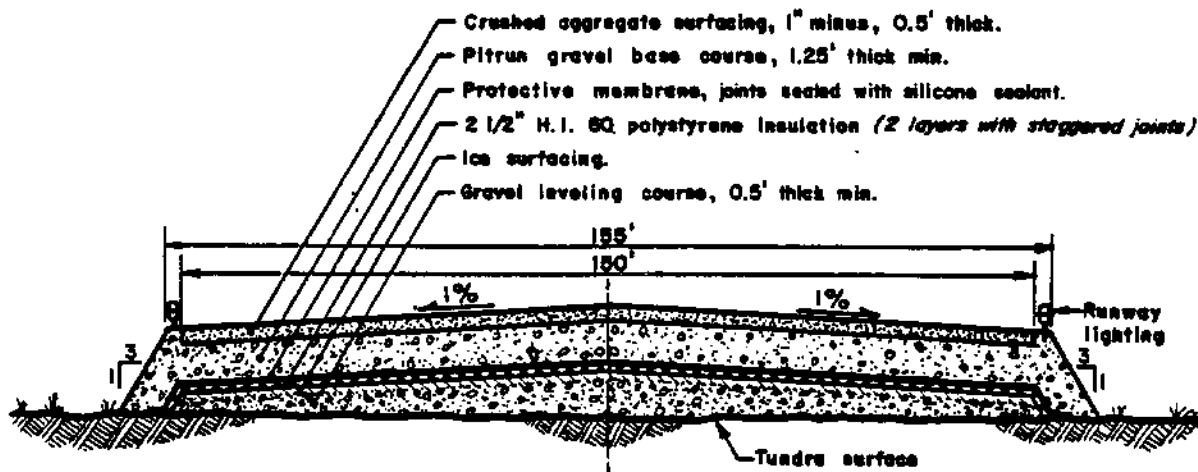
TYPICAL INSULATED RUNWAY SECTION
